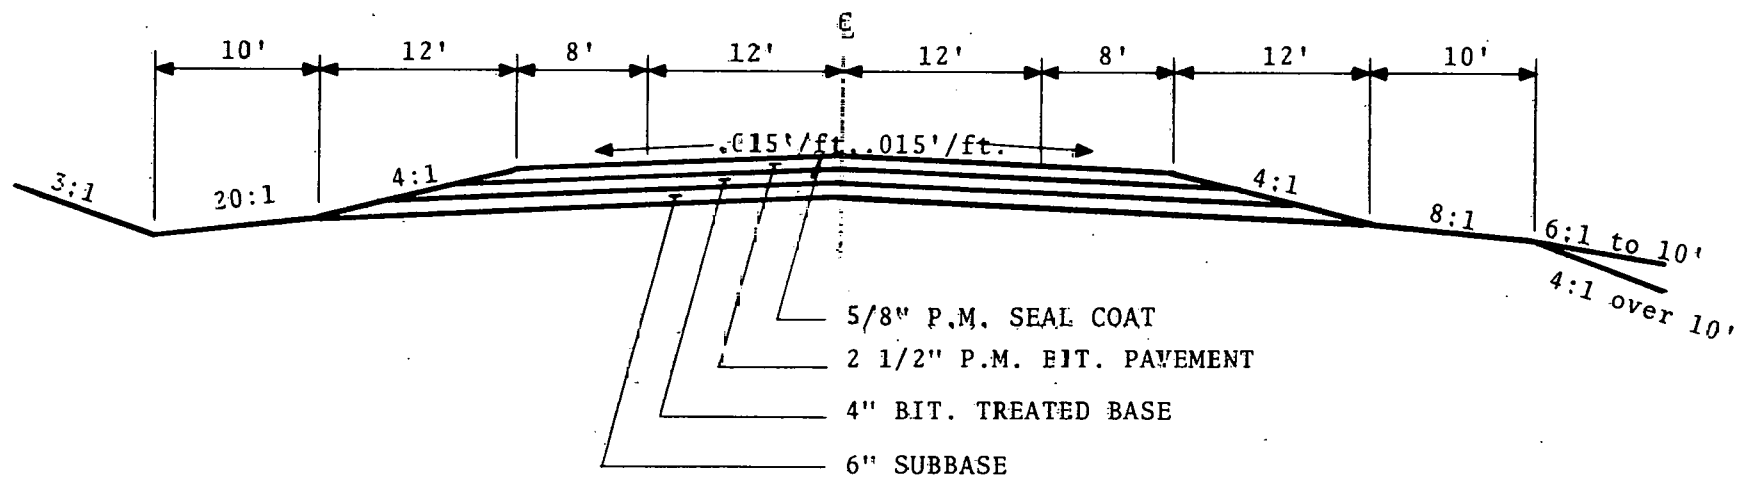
Typical section for WIPP off-site roads
